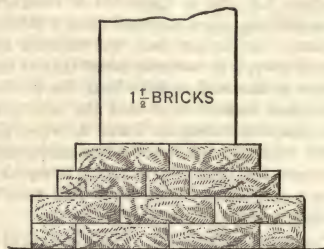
Brick Footing. Wall One and One-half Bricks Thick
